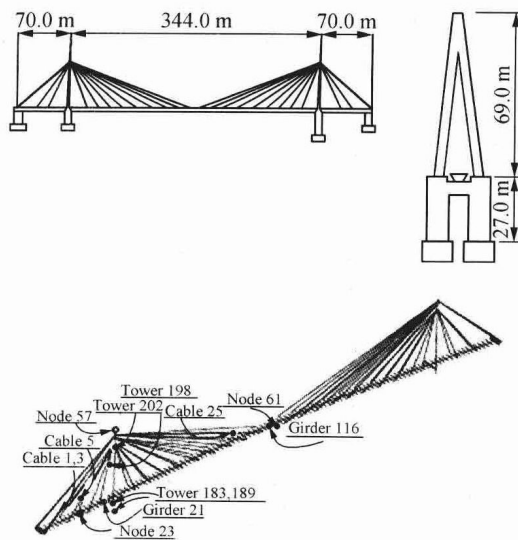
Profile and 3-D Model of the Cable-Stayed Bridge
